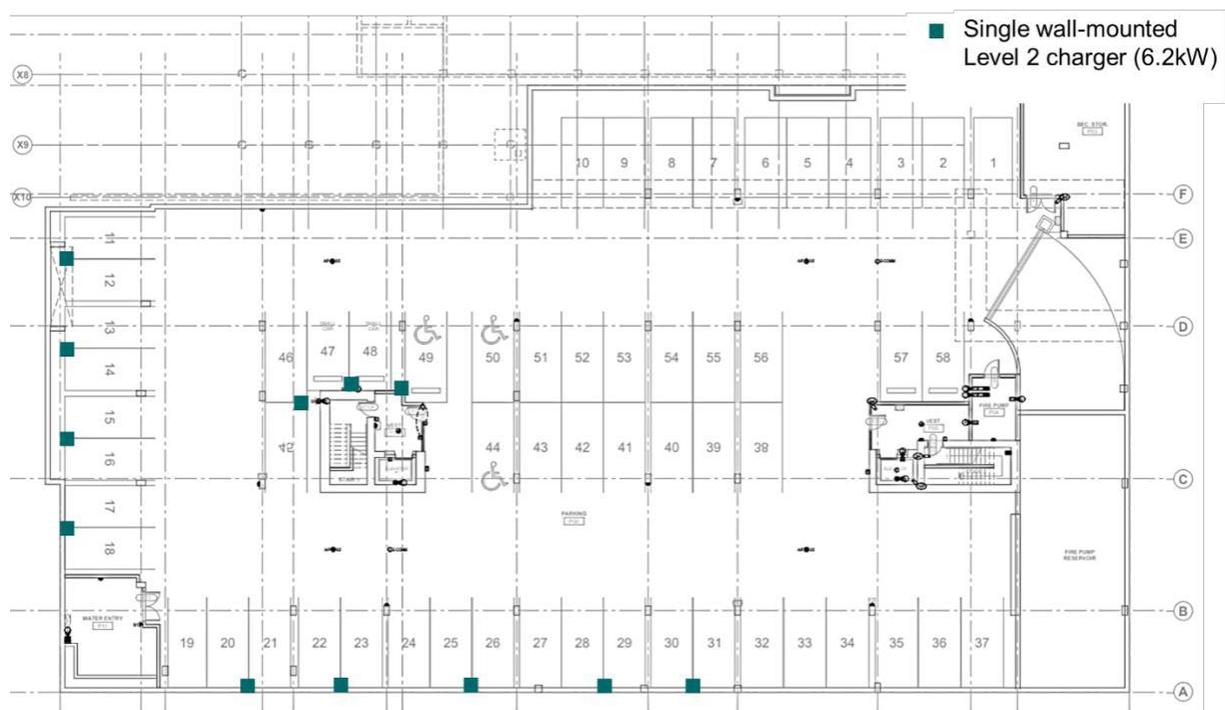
High-level layout plan showing recommended charging stations in Level P1 of the Municipal Hall Complex over the next several years
